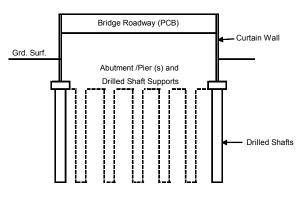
Precast-Concrete Bridge (PCB) Design Concept.
